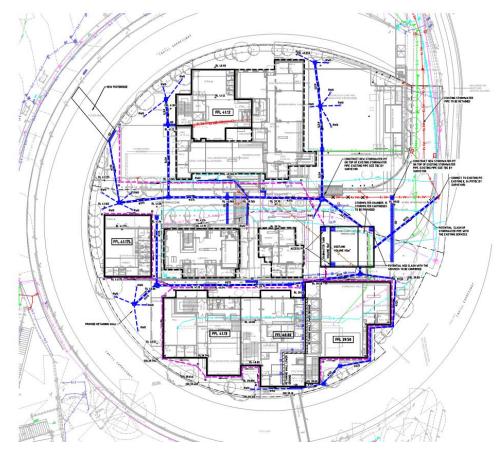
Schematic Stormwater Layout (Based on the architectural plans dated 06.12.19)
